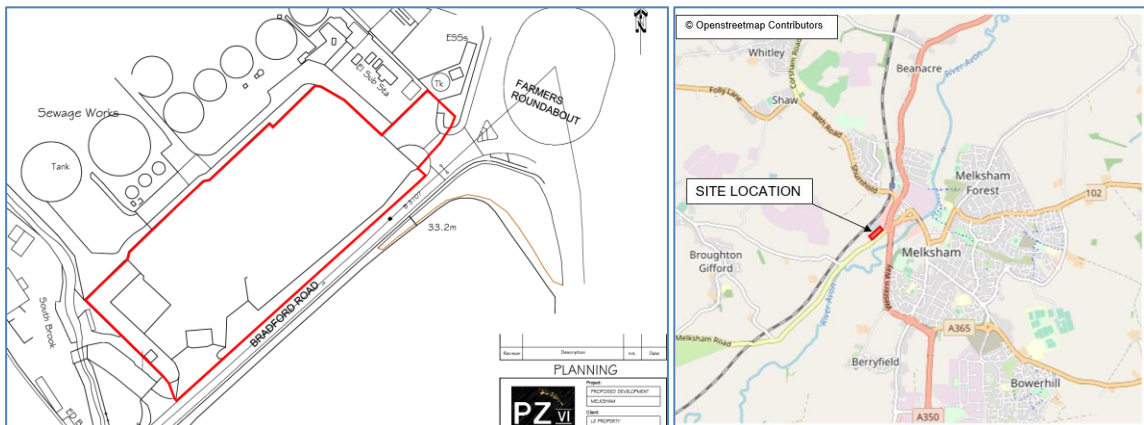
Extract from the Site Location Plan – the redline extent of the site extends to 1.1ha.
